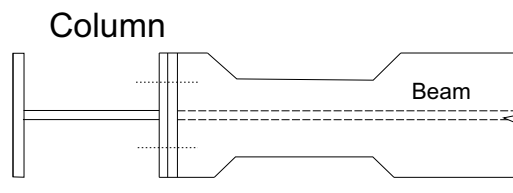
The first RBS connections proposed by Plumier (1990)
